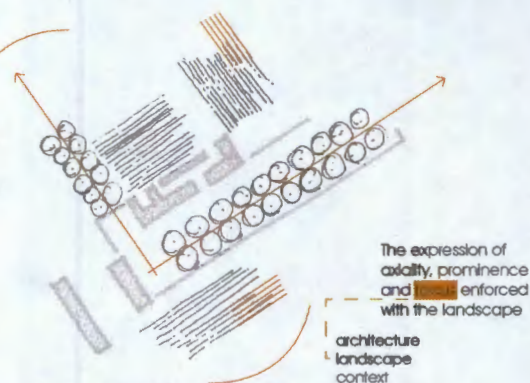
Groot Constantia: Site plan with vegetation (sketch by author, 2010)
